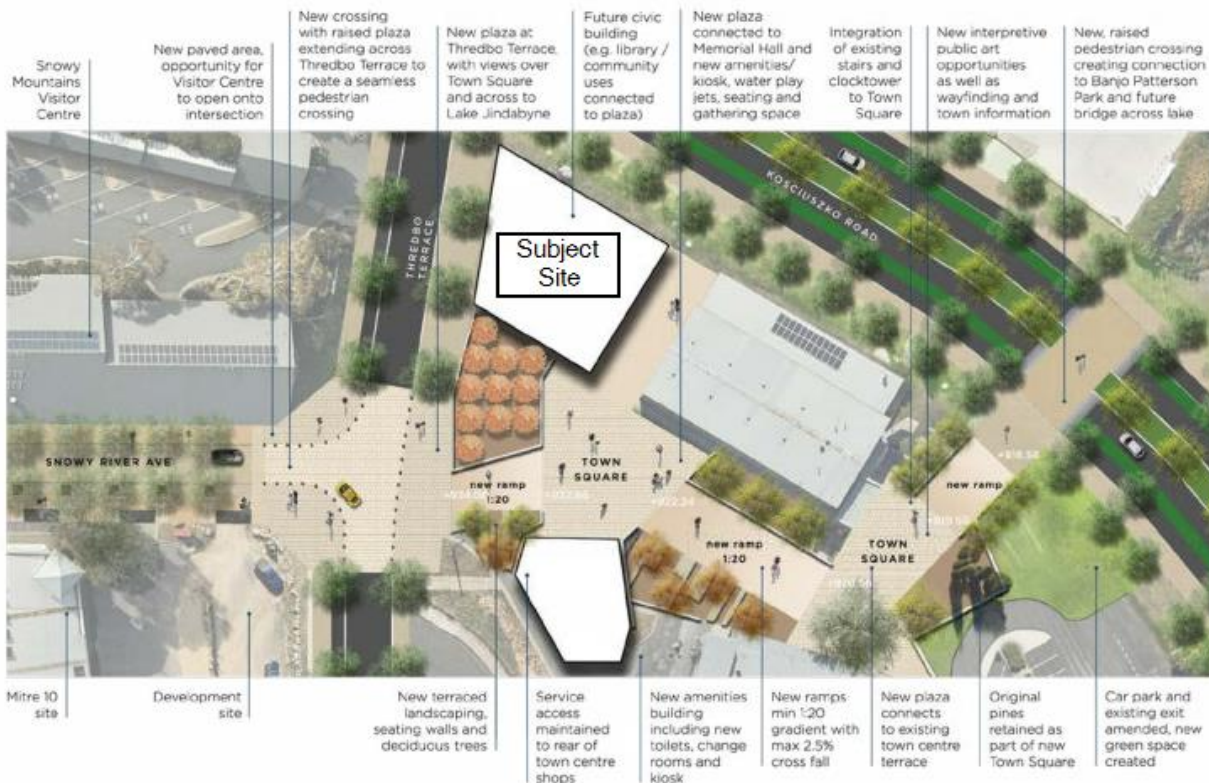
Artist impression of New Town Square with location of the proposed development indicated (subject site) (source: Snowy Mountains Special Activation Precinct Draft Master Plan June 2021)
